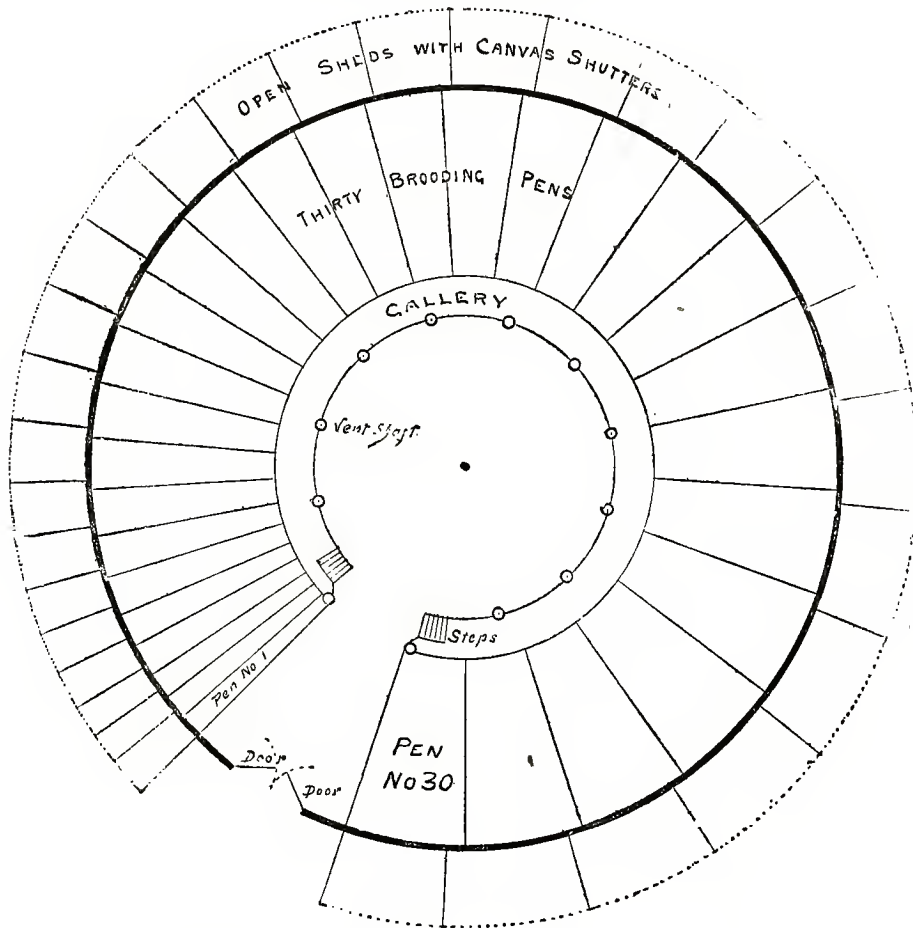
Ground Plan of Buildings of Mr. Dunbar's Plant.
